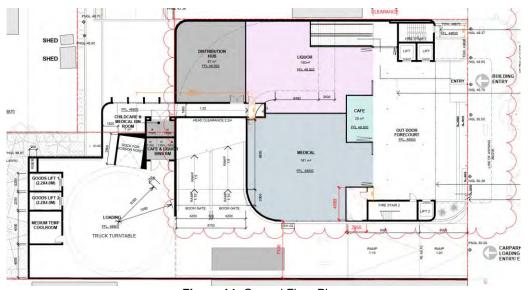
Ground Floor Plan Source: Floor Plan – Ground Floor, Drawing No. A0203 prepared by TesserArch dated 09/03/23.
